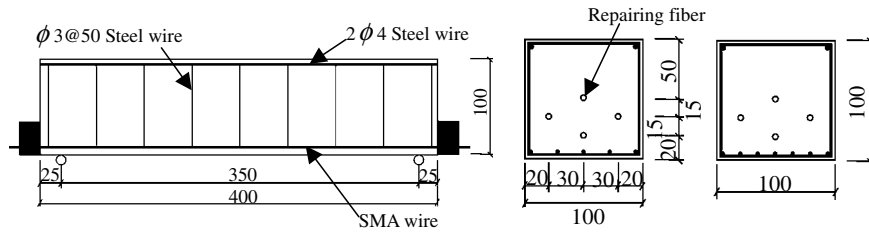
Detail and dimensions of the smart self-repairing concrete beam.
